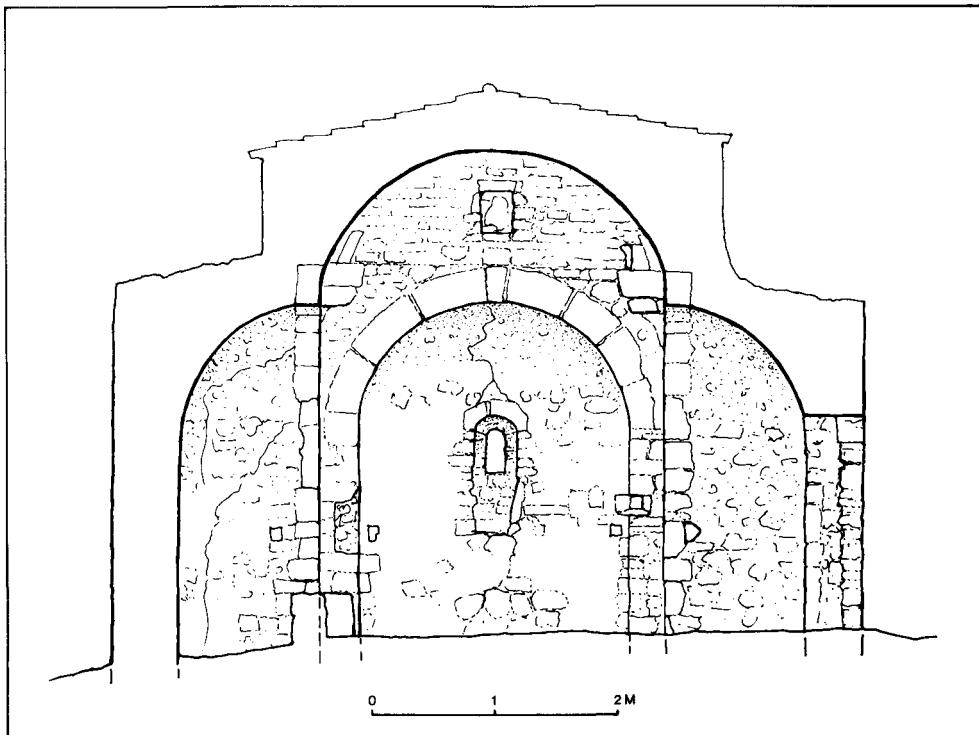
North-South section through the chapel looking east. (Drawn by Sheila Gibson)
